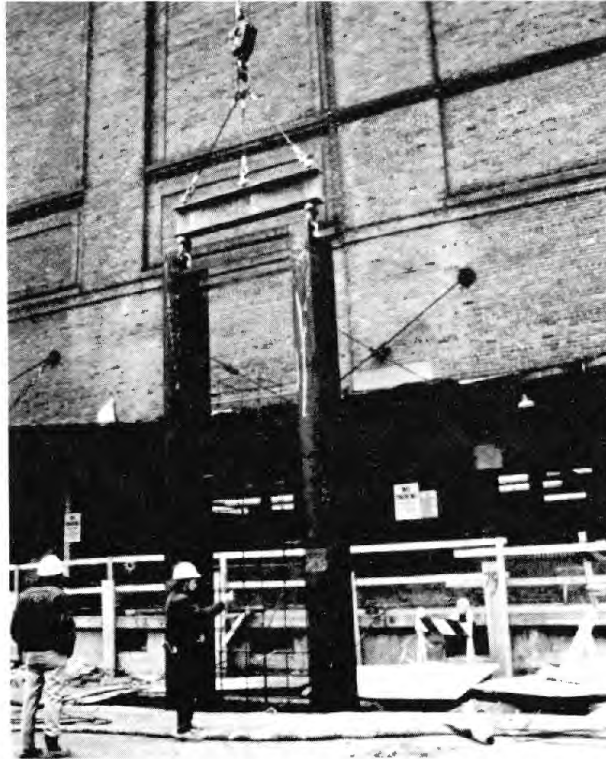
Slurry wall construction near 8-story building on Washington, D. C. Metro subway system. The building footings were within seven feet of the slurry wall. No underpinning of the structure was necessary and no noticeable damage occurred.
